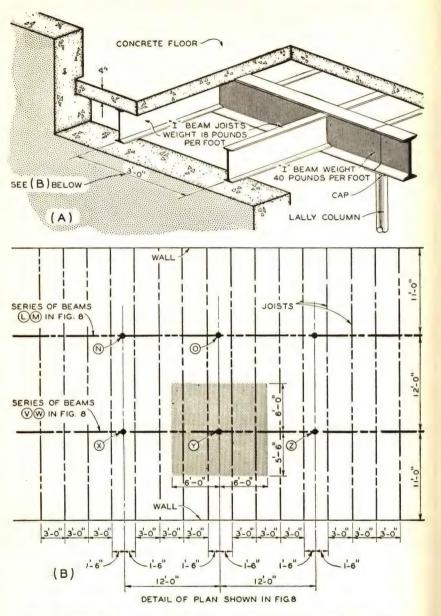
Detail of Beam, Joists, and Concrete Floor for Dairy Barn Shown in Fig. 8
